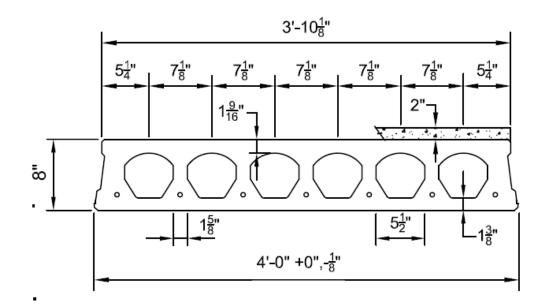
Hollow-core Concrete Plank Nitterhouse Concrete Products
